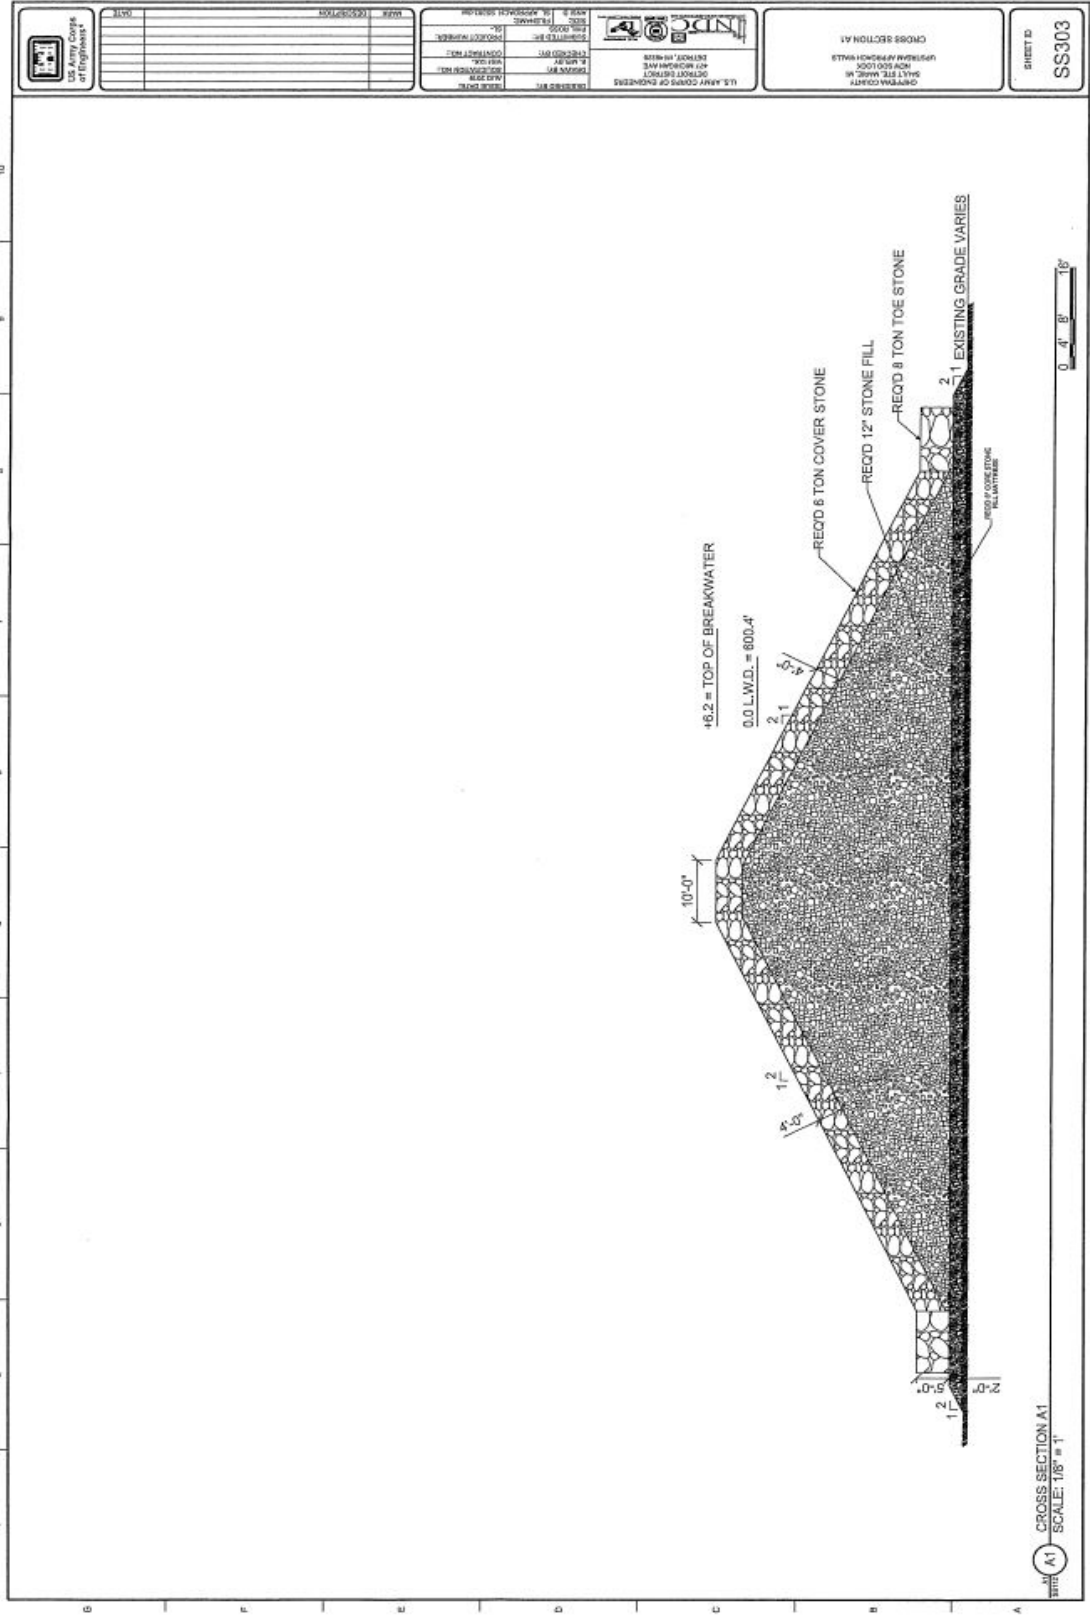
Cross Section of rock placement adjacent to the Whales Mouth Mooring Area.
